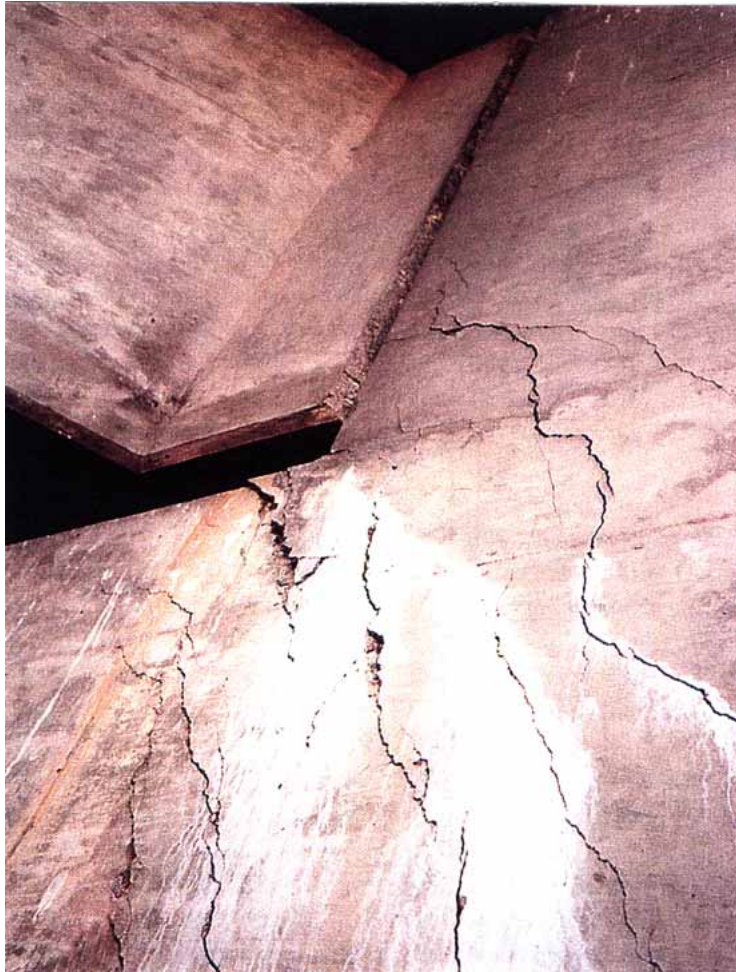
Cracking in the abutment wall near an acute corner of the superstructure for the bridge shown in figure 9-2.⁽⁵²⁾
